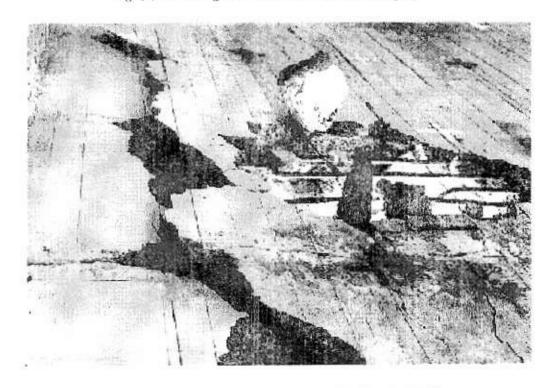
A typical punching shear failure of bridge deck.[3]
